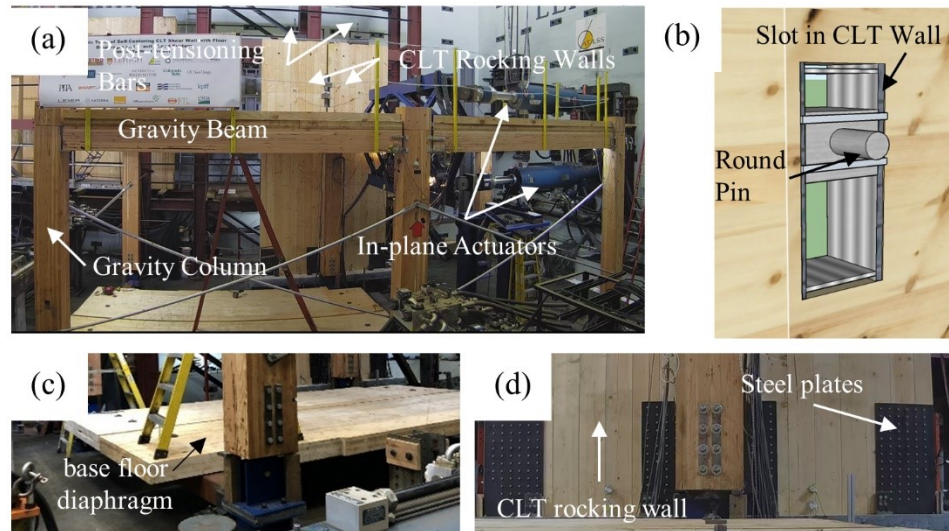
Structural test specimen; (a) Test specimen, (b) Collector-beam-to-CLT rocking wall connection, (c) Base floor diaphragm, (d) Repaired CLT rocking wall
